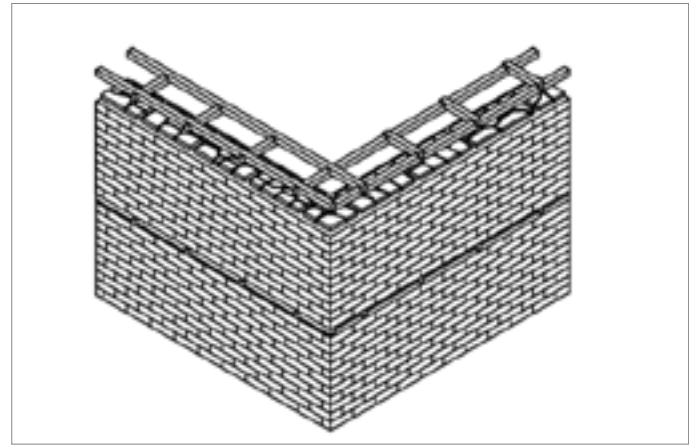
Building system scheme of timber hooping (drawing: D. Omar Sidik).
